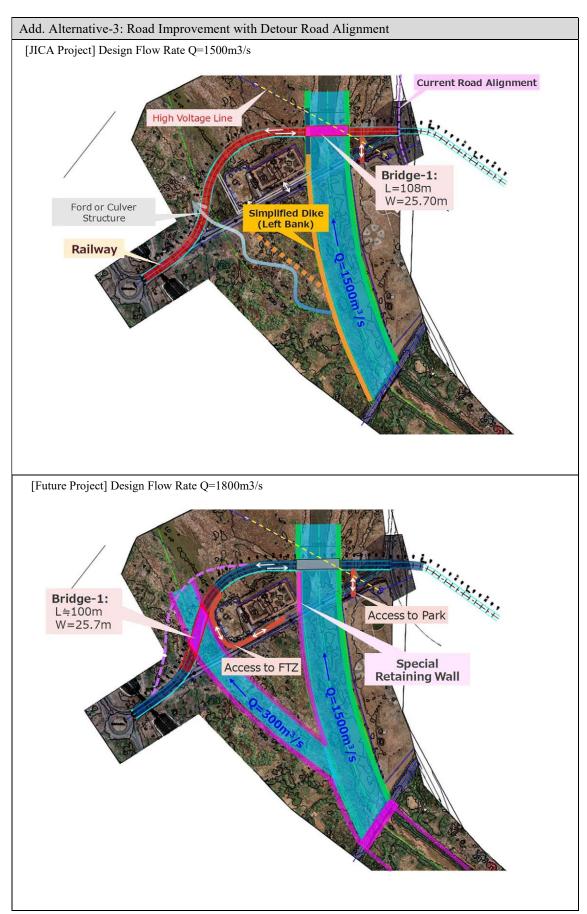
Outline of Plan (Add. Alternative-3)
